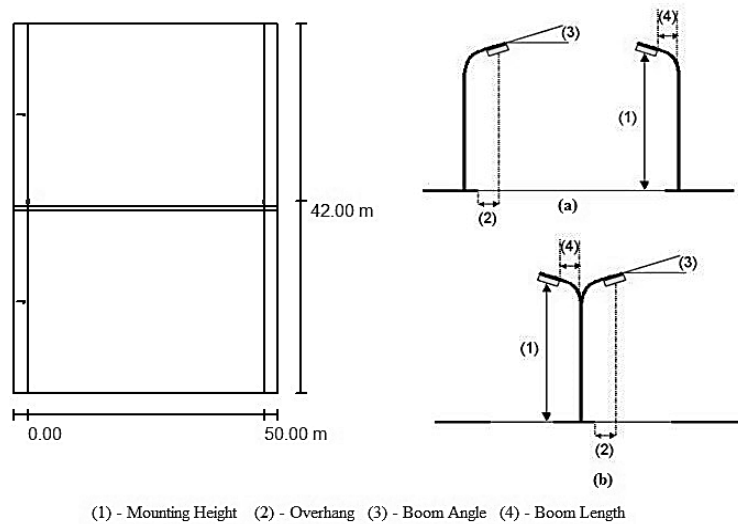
Plan View of Haul Road Lighting Arrangement for the Mine. (a) Lighting Arrangement Provided on Both Side of the Road Dual Row Opposite (b) Lighting Arrangement in the Median
